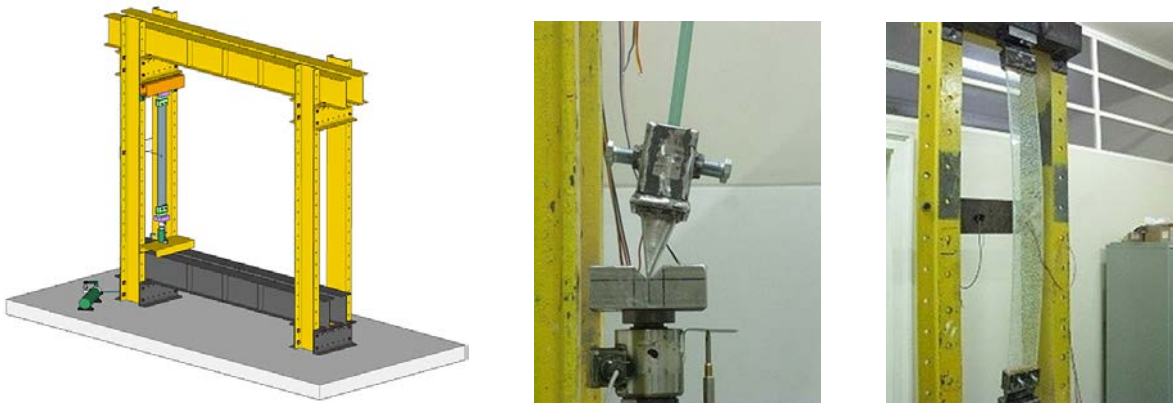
(a) test set-up; (b) detail of hinged support; (c) destroyed specimen.
